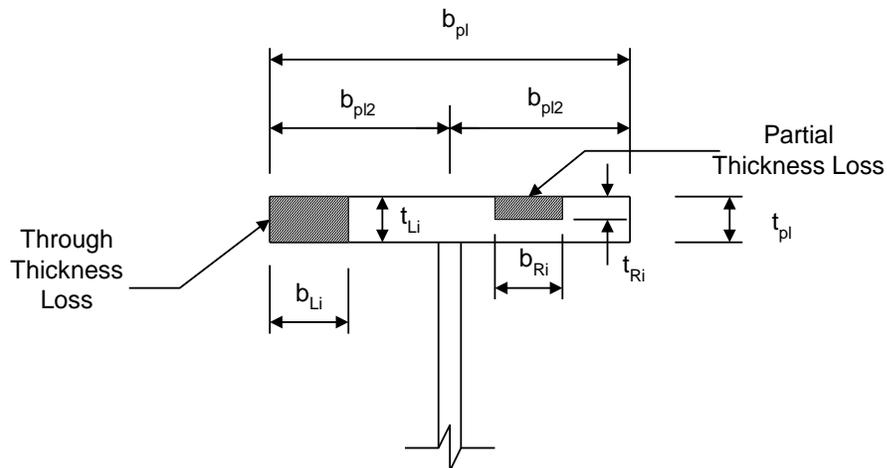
Cross-Sectional View of Plate Girder with Section Losses
